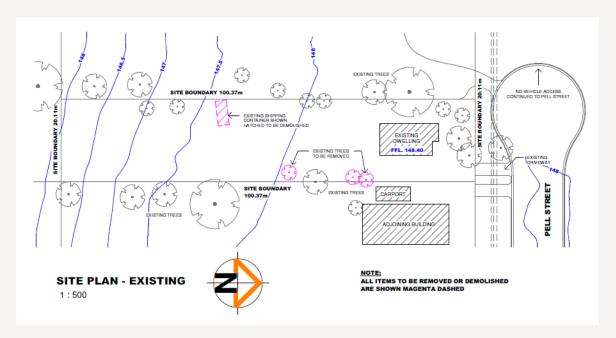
| Proposed Demolition Plan (Source: Rob Pickett Design)
